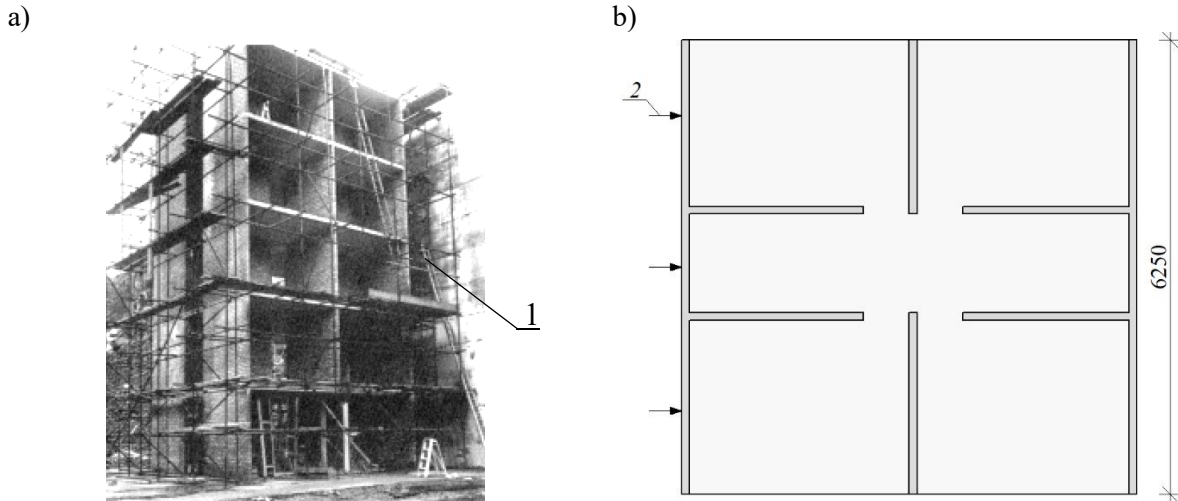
Full-scale building model [69]: a) view of the structure, b) plan view: 1 – tested building, 2 – horizontal load (three jacks per floor)
